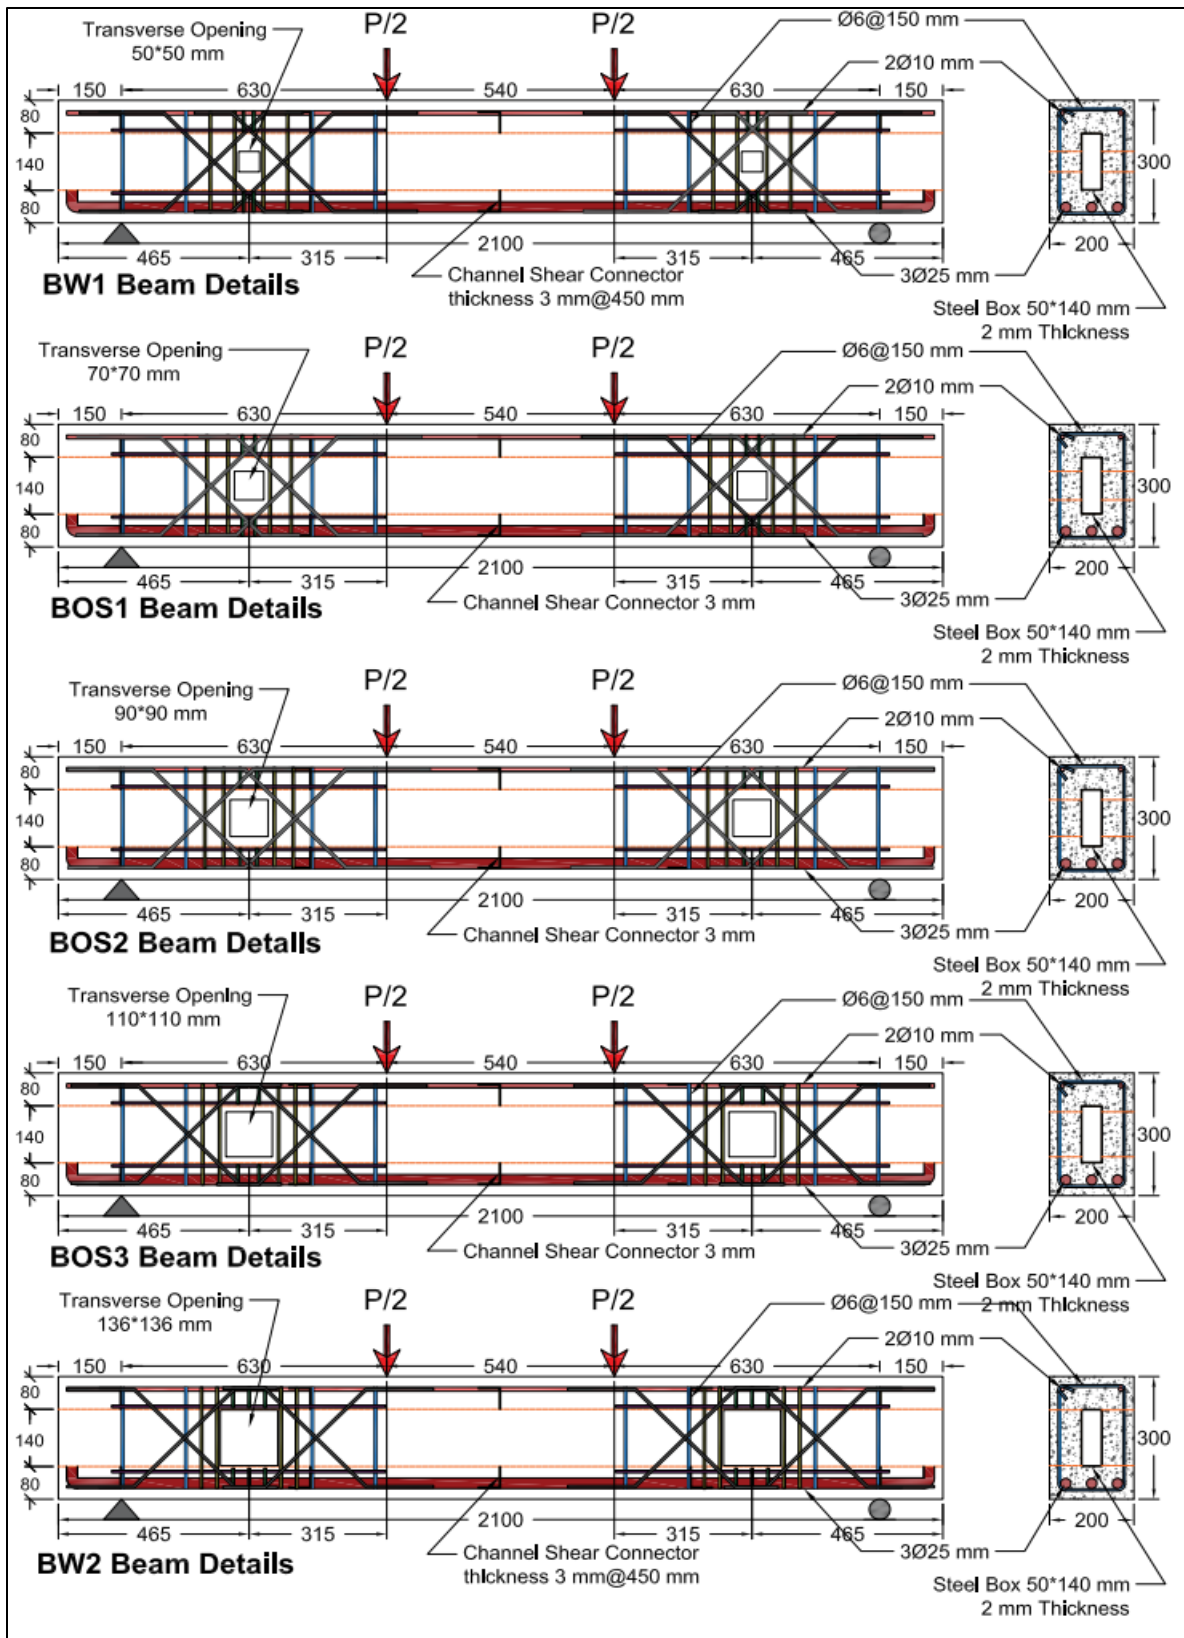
Details of Beams of Opening Size Parameter in Group 1
